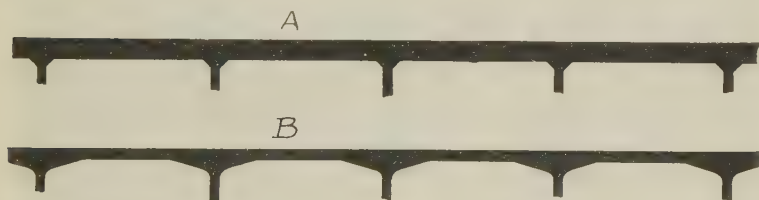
SILHOUETTE ELEVATIONS OF TWO DESIGNS SHOWING SAVING BY CONTINUOUS STRUCTURE.
